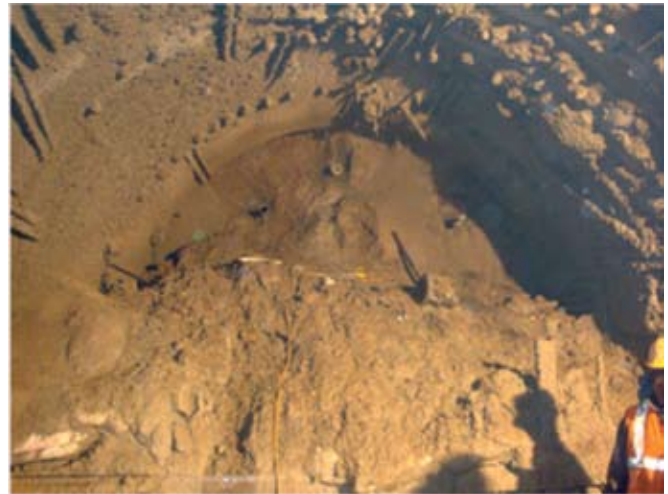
Shotcreted Face with Drainage and Grout Holes
